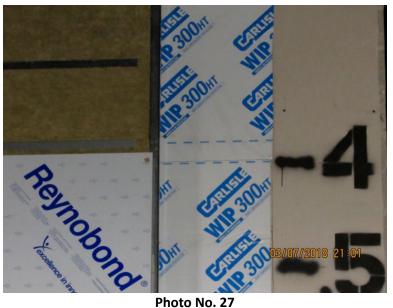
Panels Installed on Clip Not Fastened to Respective Girt
